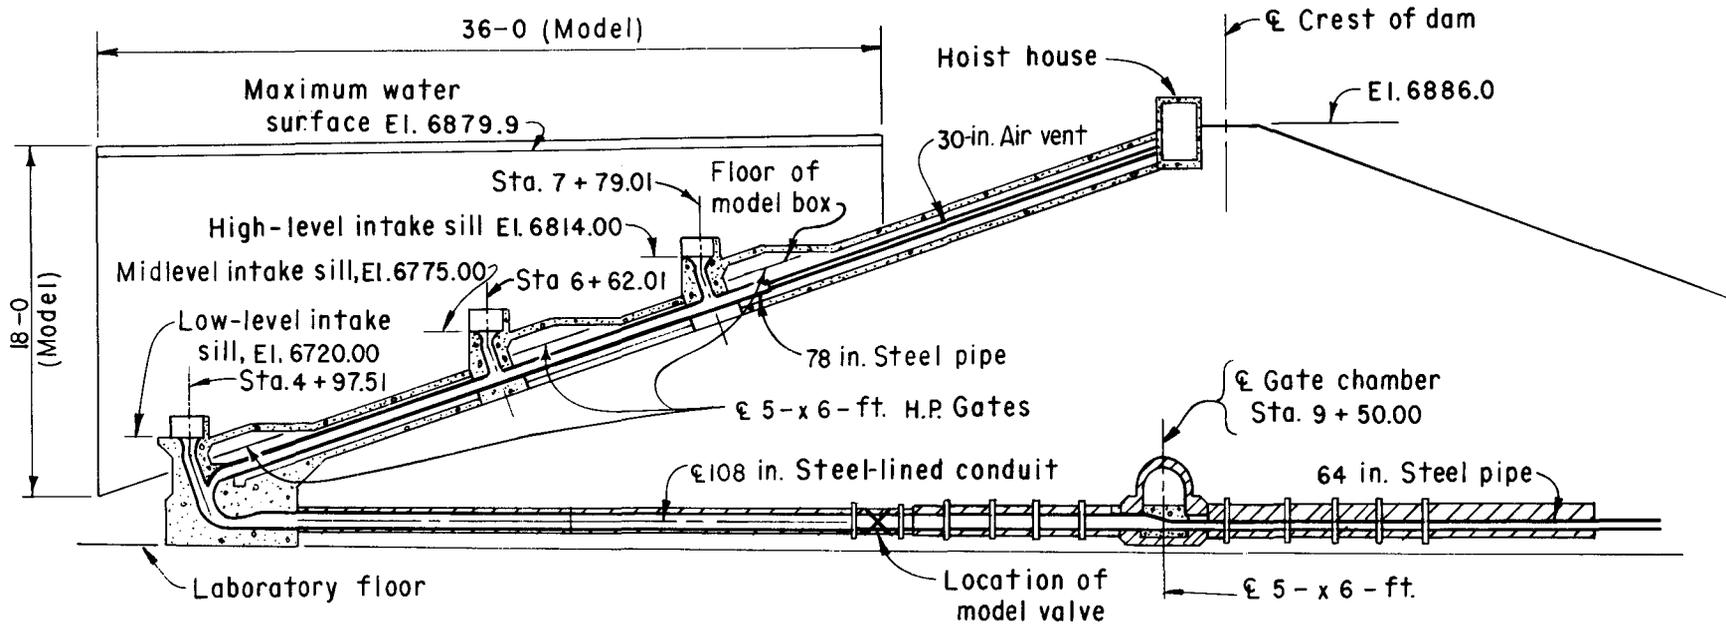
Ridgway Dam inclined multilevel outlet structure.
